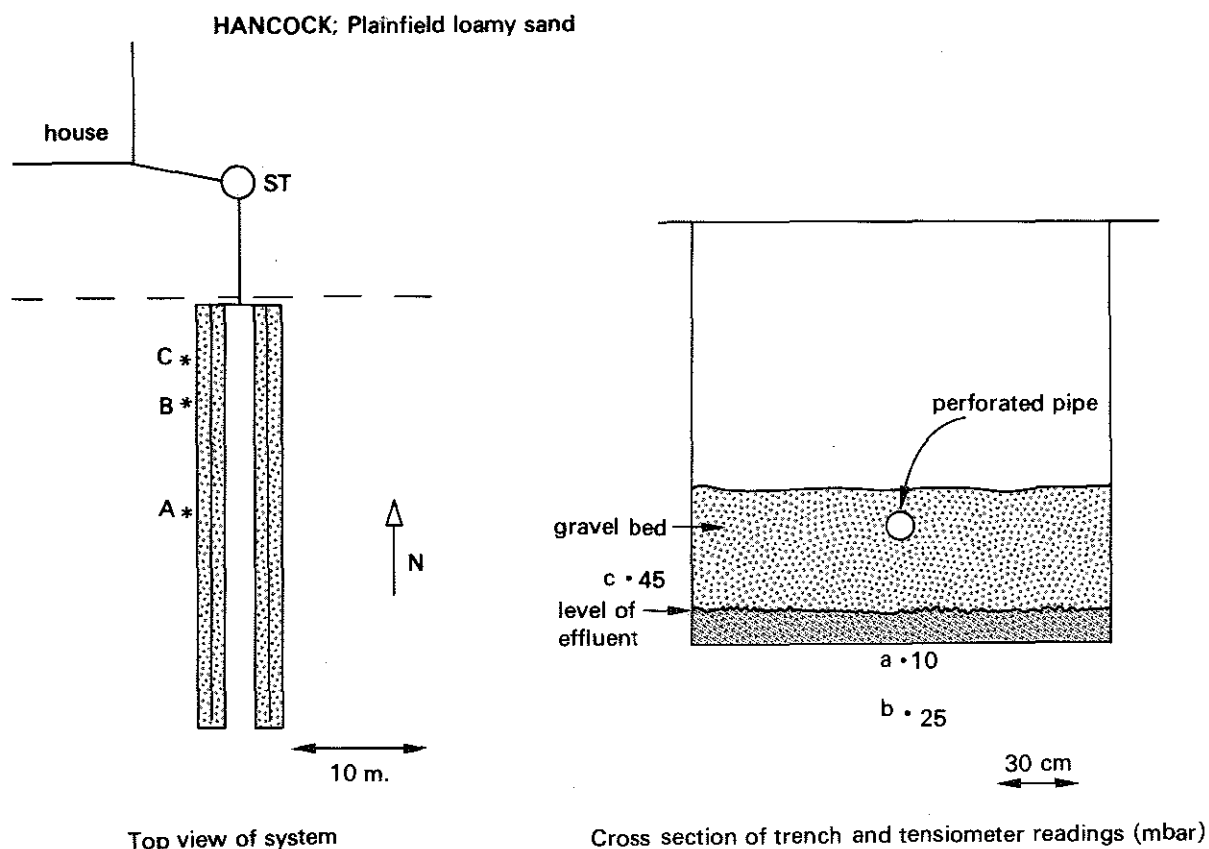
Top view and cross section of the seepage bed with locations and readings of tensiometers (Hancock).
